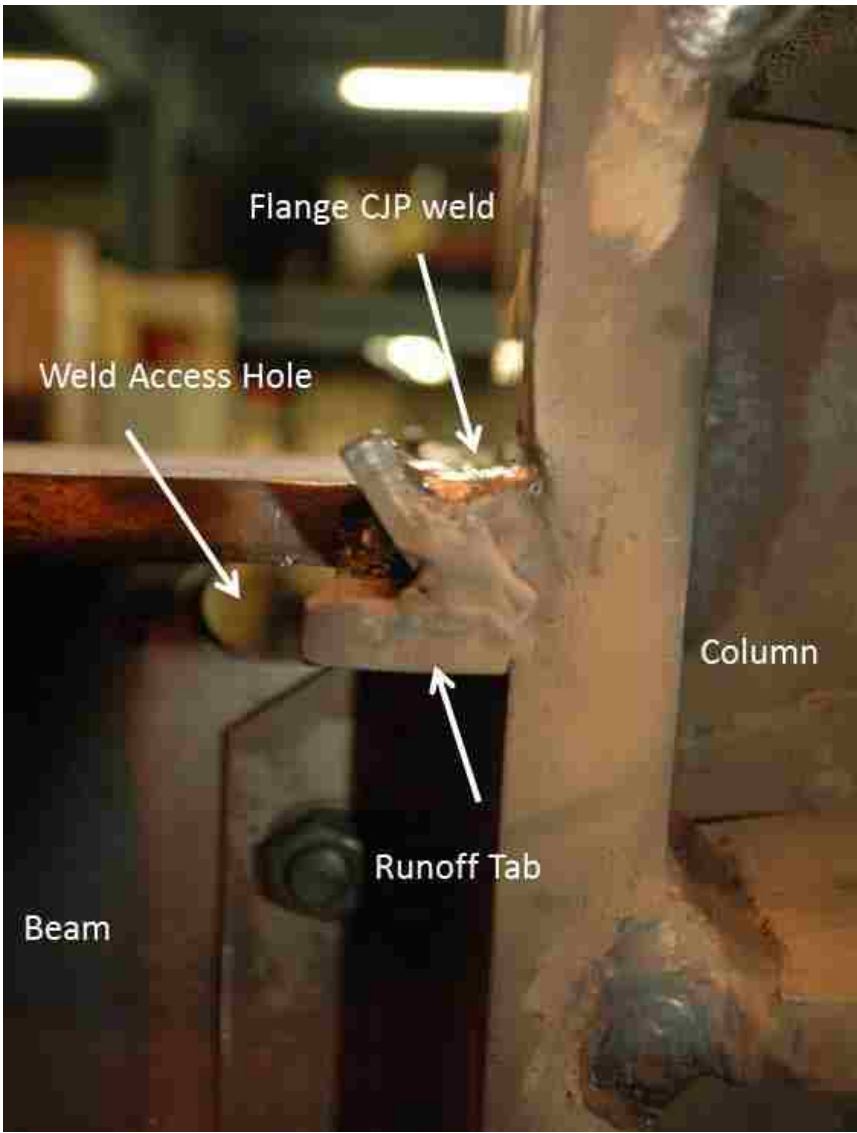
Ground Floor Top Flange with Run Off Tabs, Post Welding
